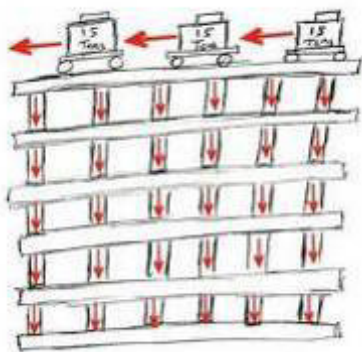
The scheme of placement on the roof of three huge industrial air conditioners
